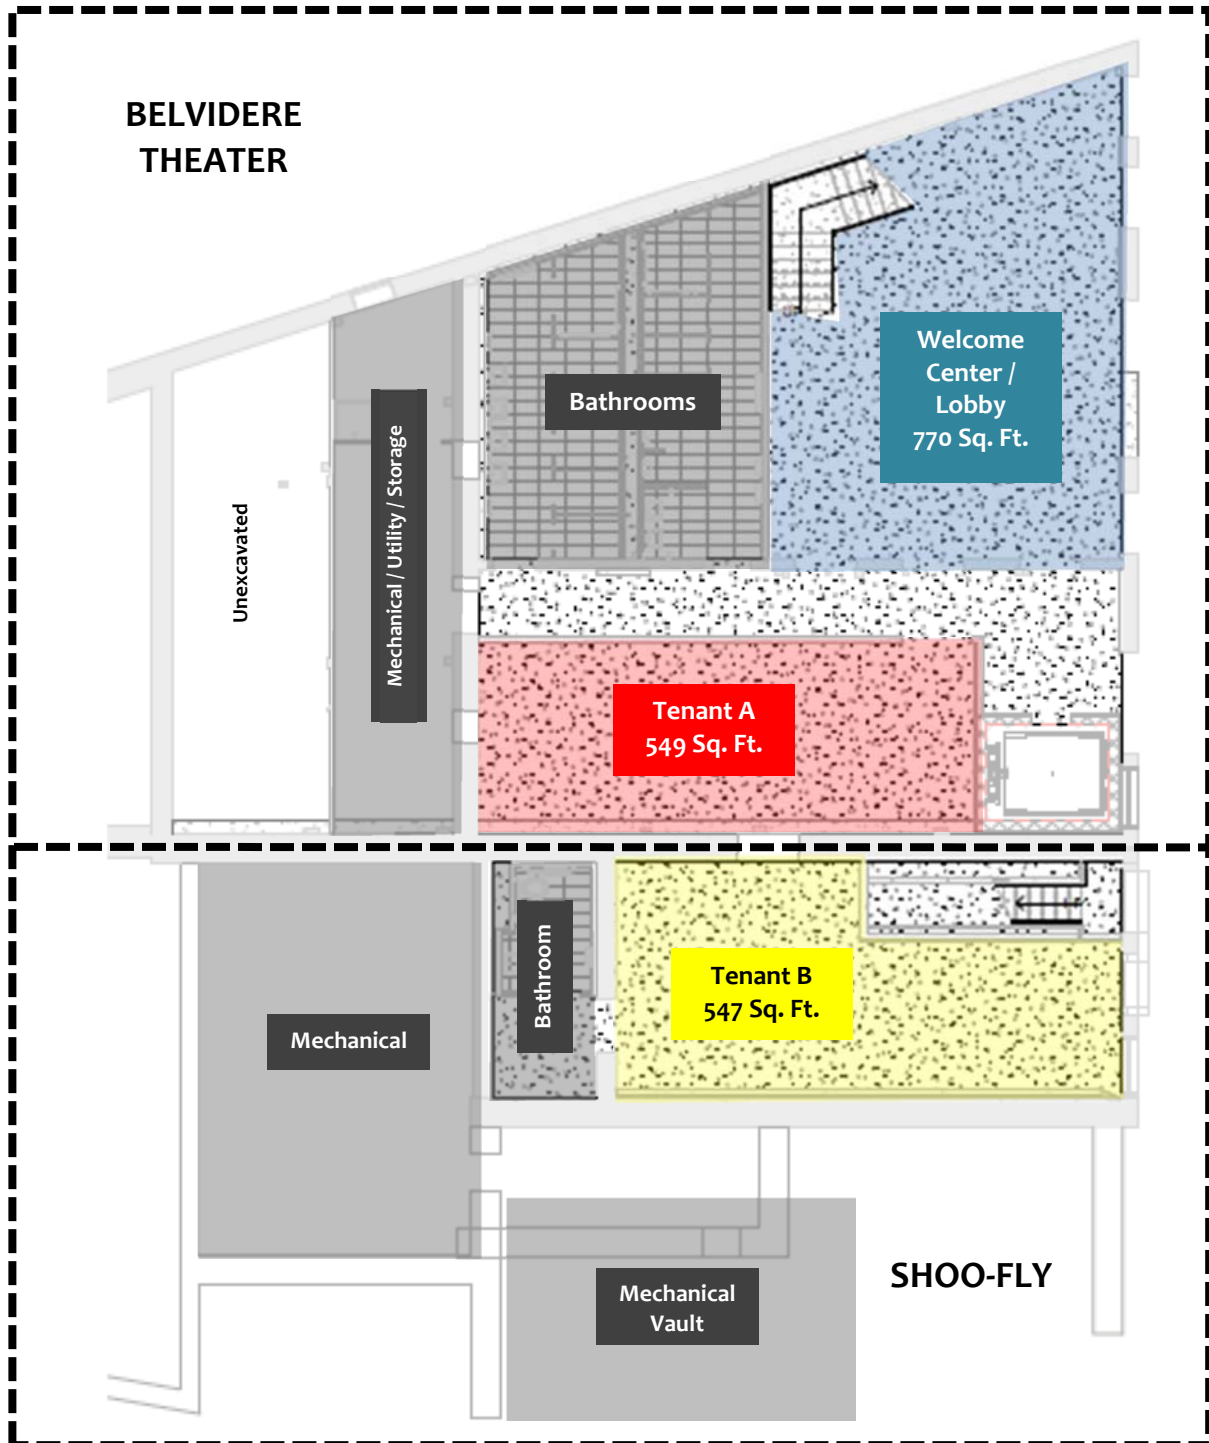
(Second Floor Finish Plan), Figure 17 (First Floor Finish Plan), and Figure 18 (Mezzanine Finish Plan) shown below depict the locations of the Theater space (including Green Room / Dressing room), restaurant space, tenant spaces and common areas (including bathrooms and mechanical / utility rooms) within the Shoo-Fly and the Belvidere Theater.
